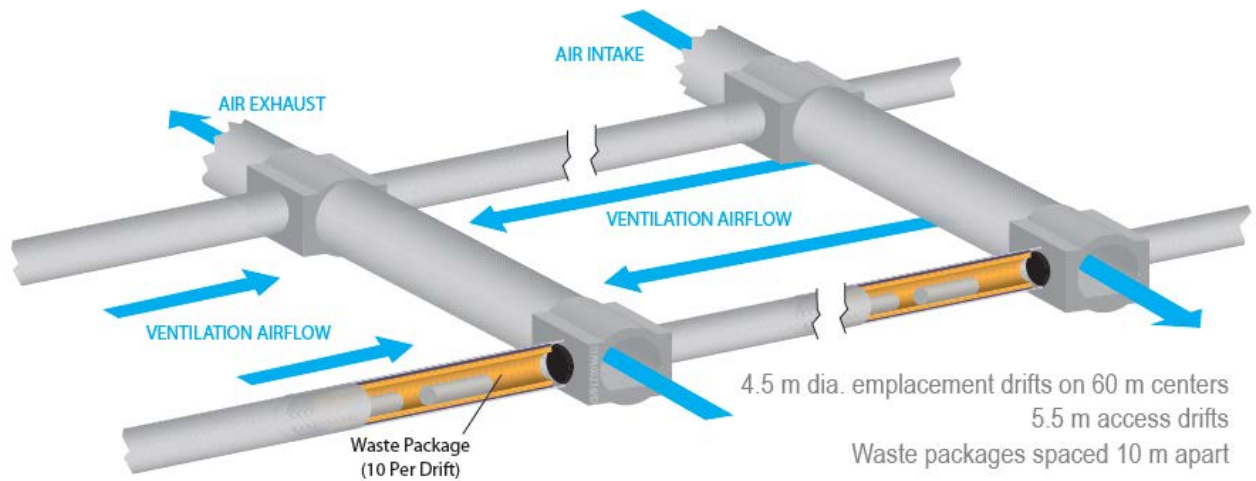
Schematic of Shale Unbackfilled Open Disposal Concept
